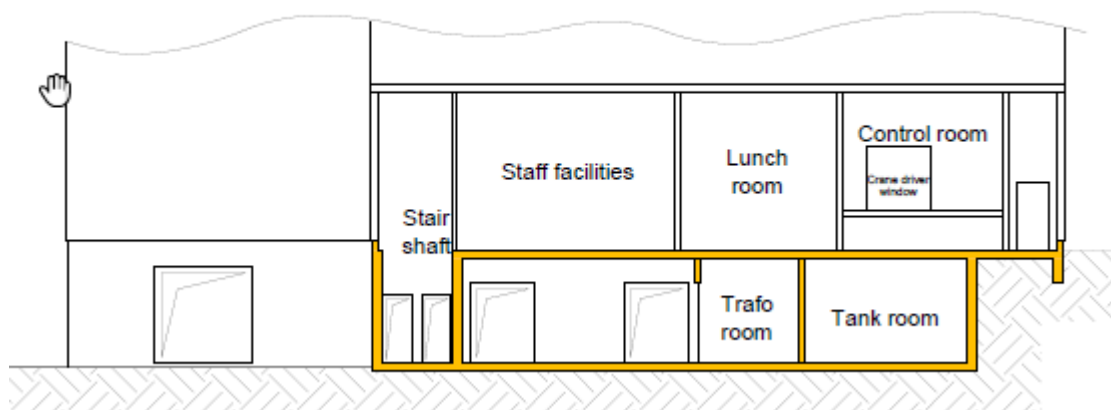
Longitudinal section of the WtE plant showing staff facilities
